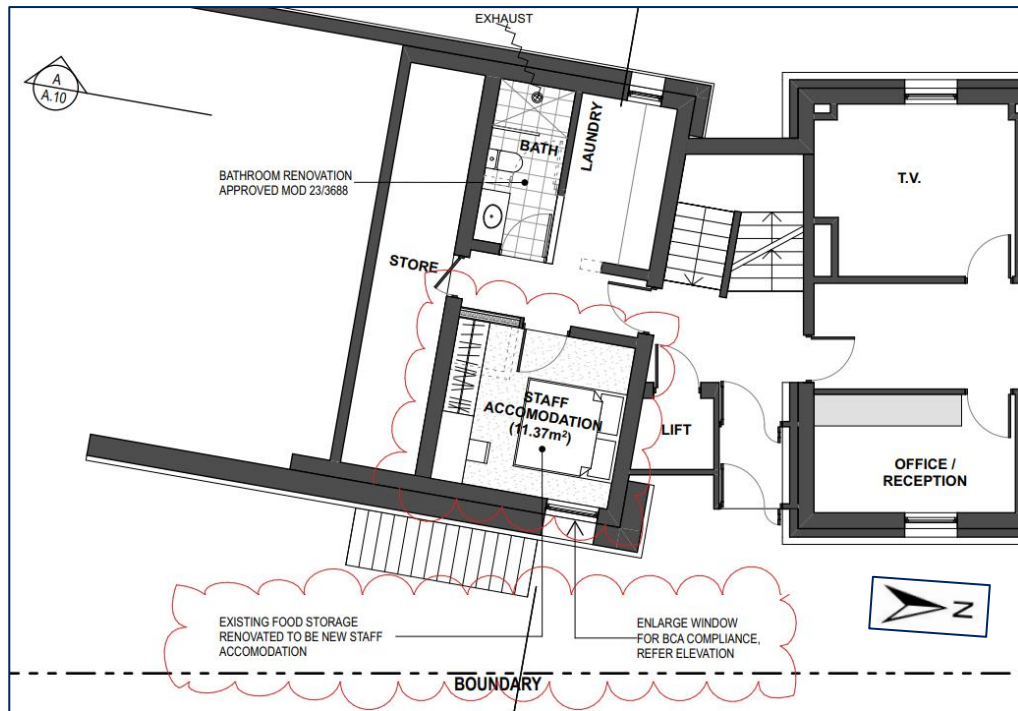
| Level 1 bedroom for staff accommodation and window modifications (Source: Applicant's documentation)
